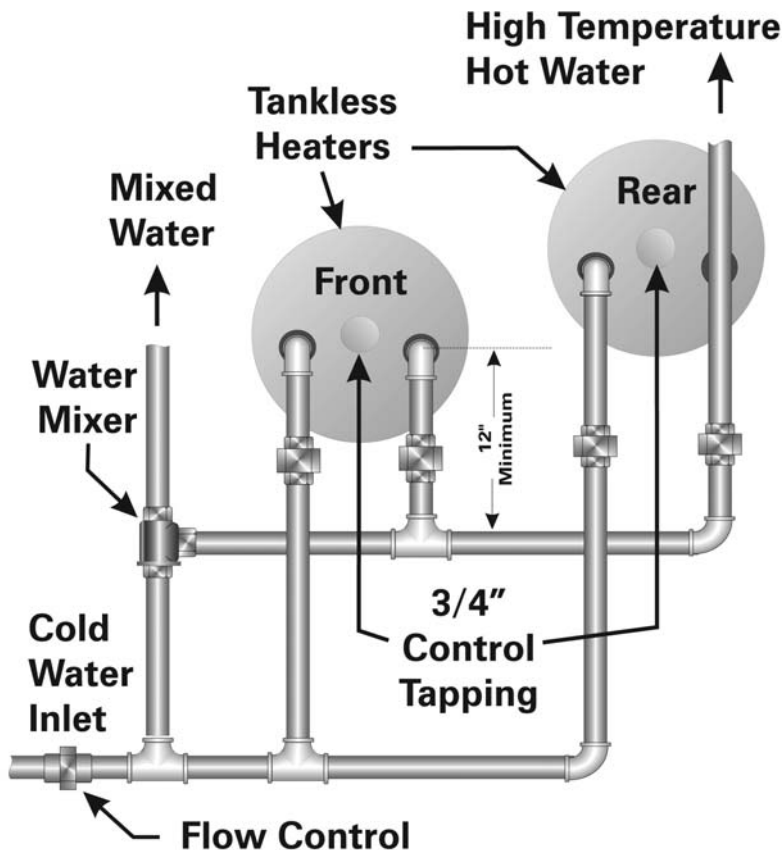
Suggested Piping – Dual Tankless Coil Installation
